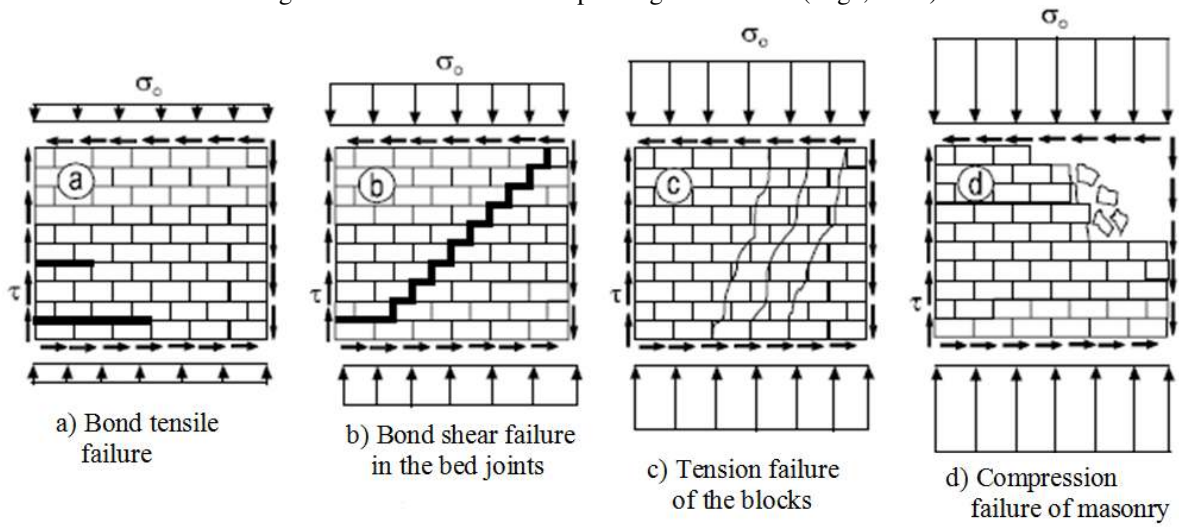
Classification of failure mechanisms in masonry under compression and shear (Mann and Muller, 1982).
